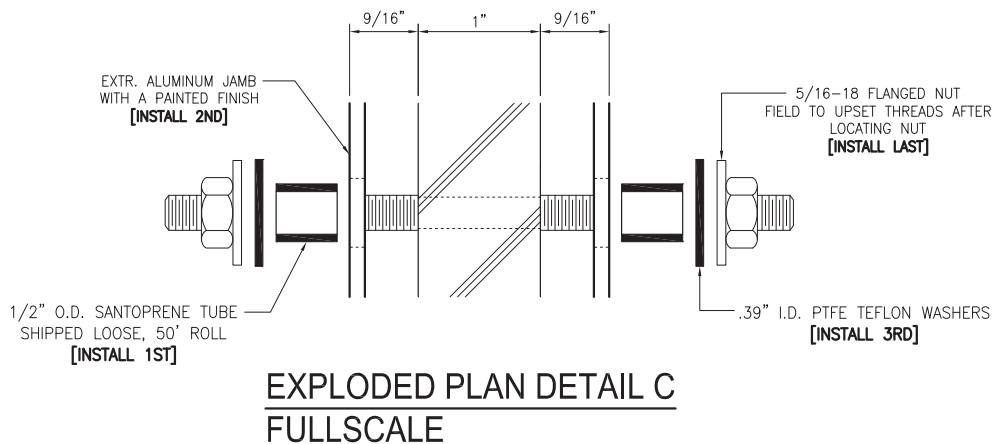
Stainless-steel hardware isolated from coated aluminum plate assembly.
